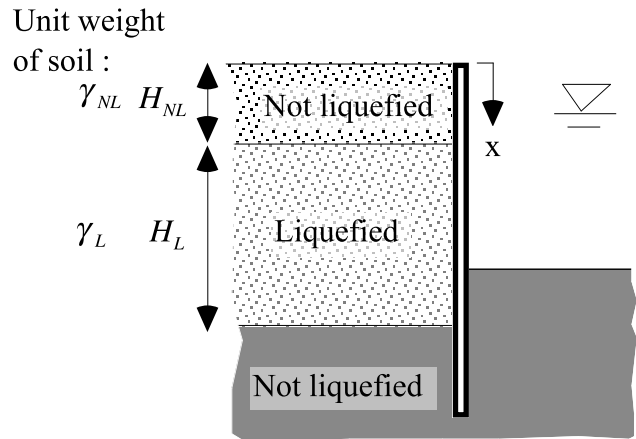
Model of sheet pile wall with liquefied backfill
